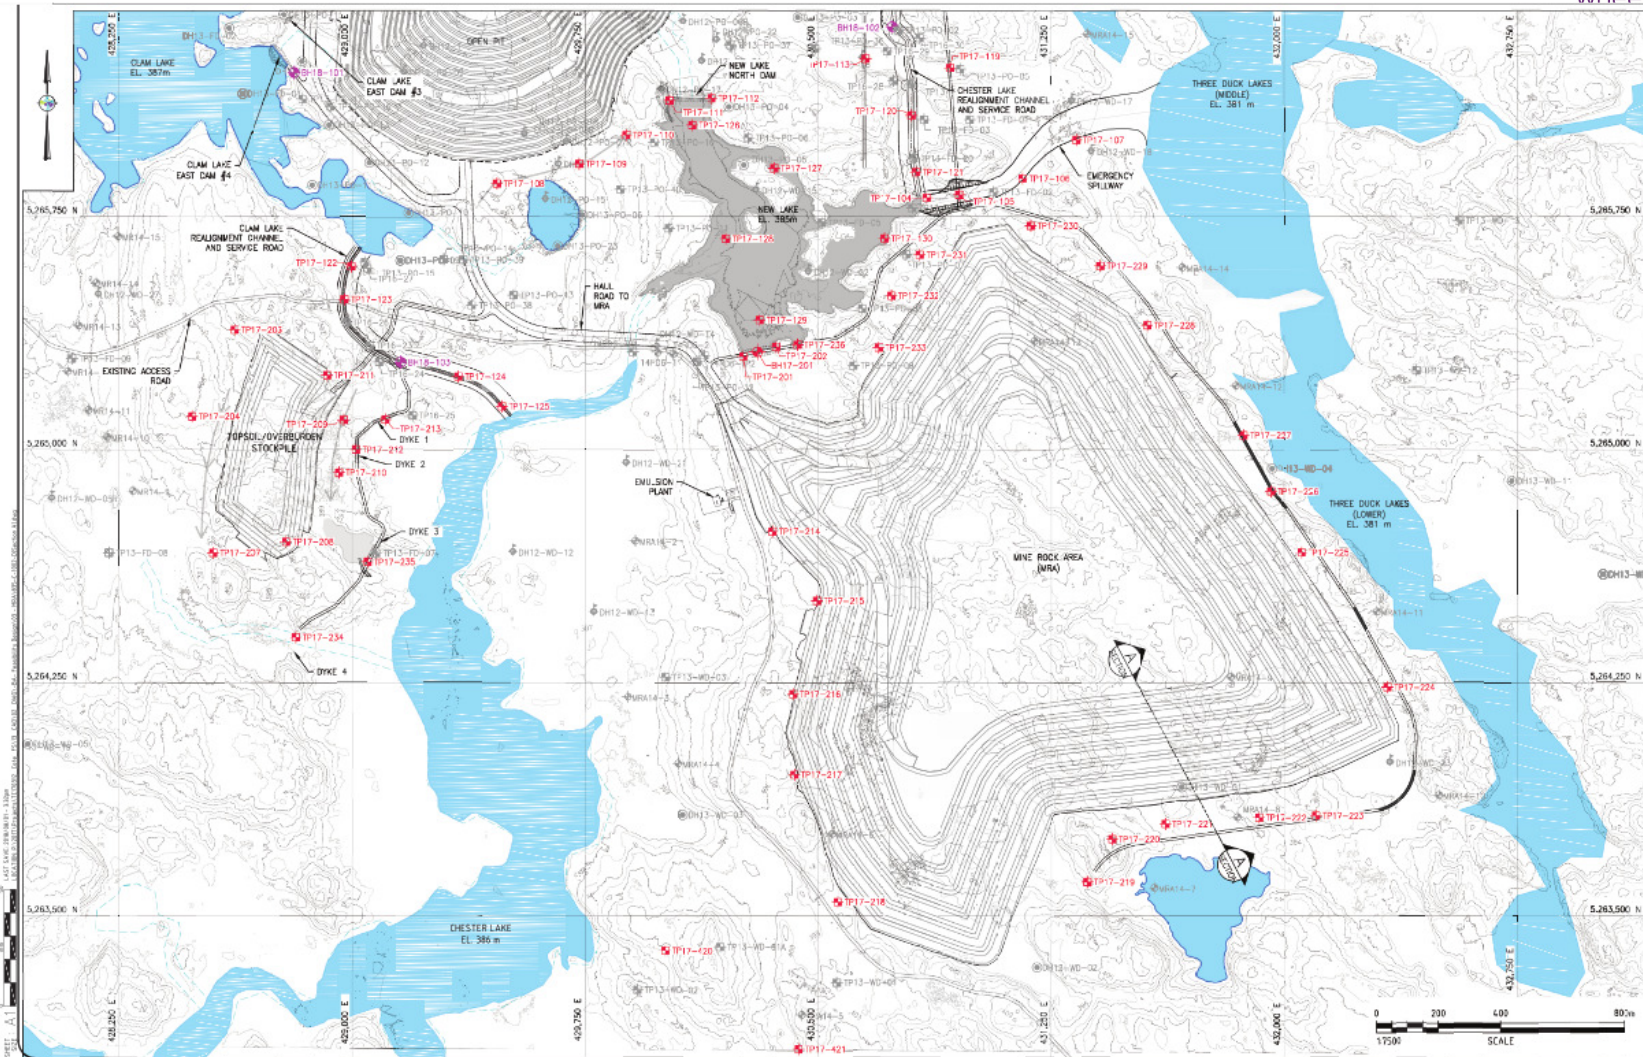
MRA Waste Rock Pile – Plan and Stability Analysis Section Location
